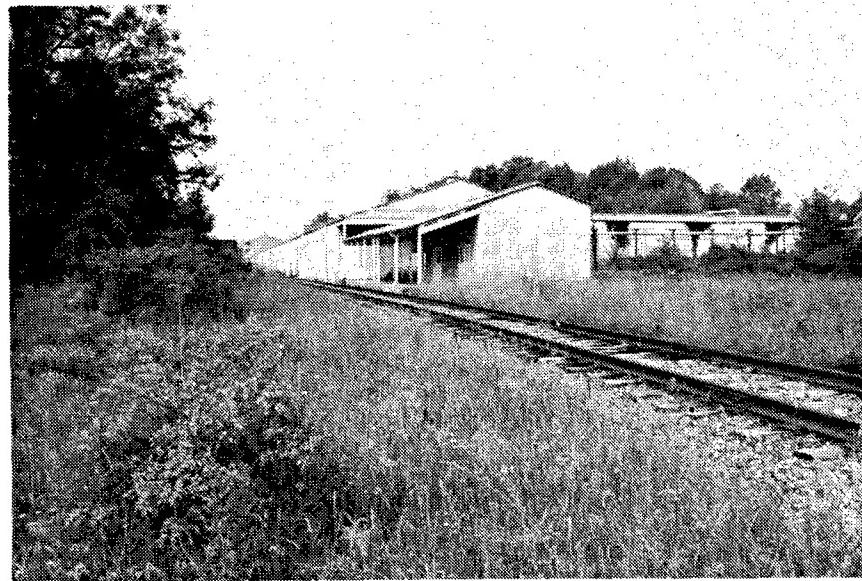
Building G-2 and Building G-3: Paint Storage Building and a Receiving and Painting Building, respectively.
